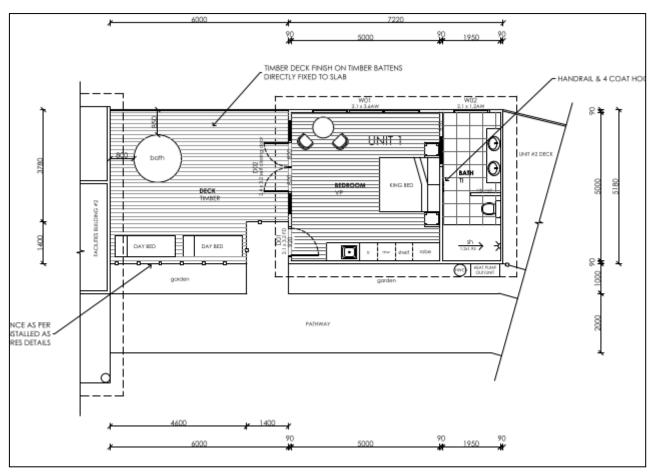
Unit 1 - floor plan (Source: RFS Projects)
